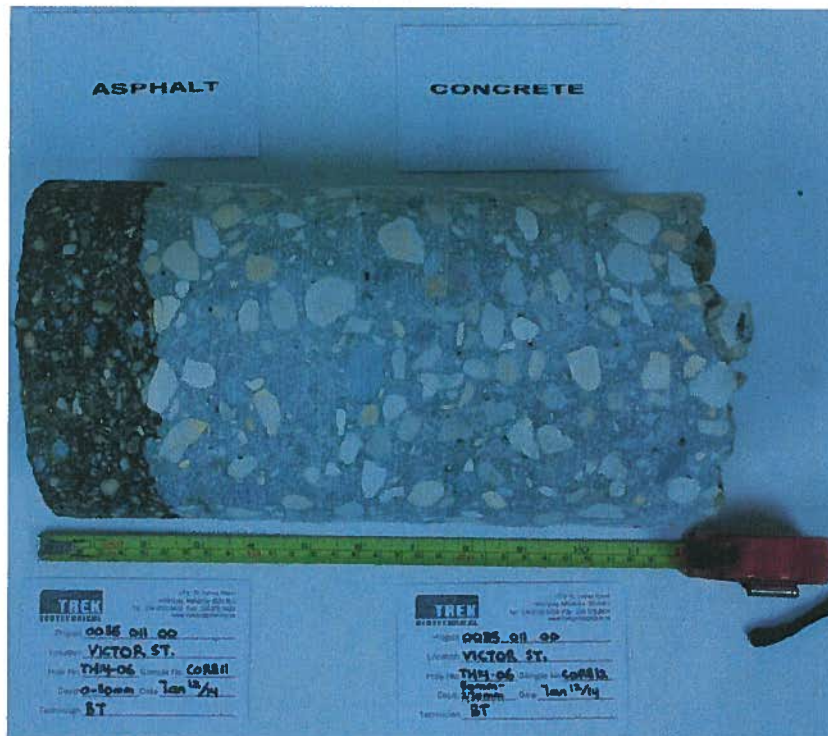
Asphalt and Concrete Core Sample from Test Hole TH14-06
